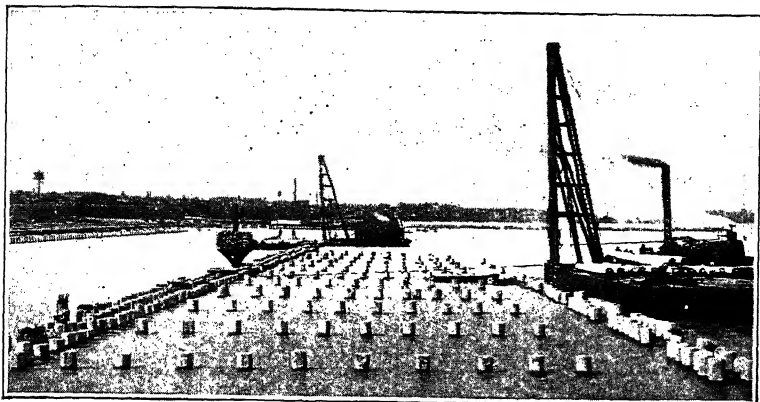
Concrete piles driven for the Pennsylvania Railroad ore dock at Cleveland, Ohio.
